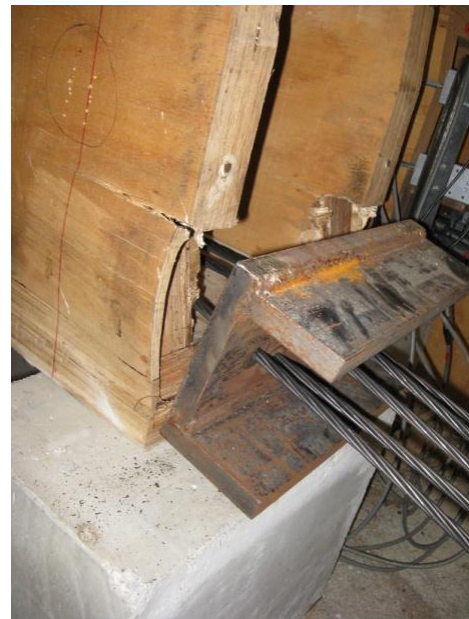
Crushing failure due to eccentric loading and insufficient bearing area between the steel anchorage block and LVL.
